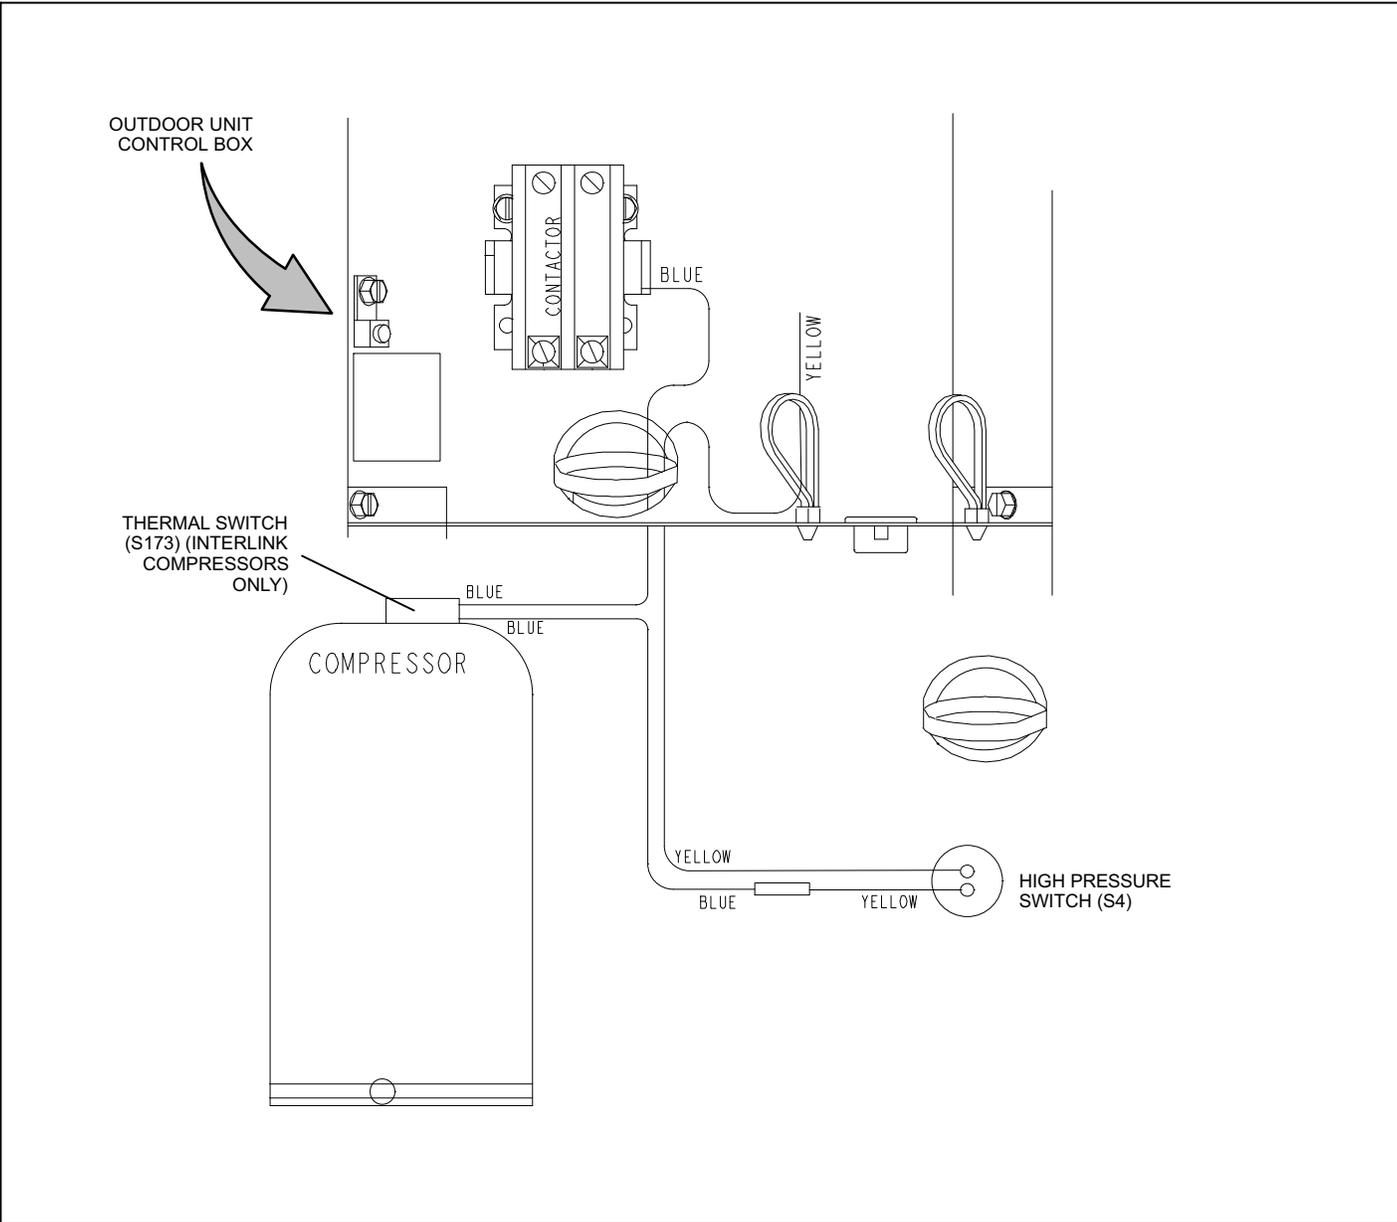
Typical Compressor S173 Thermal Switch Wiring (Air Conditioner) Example
